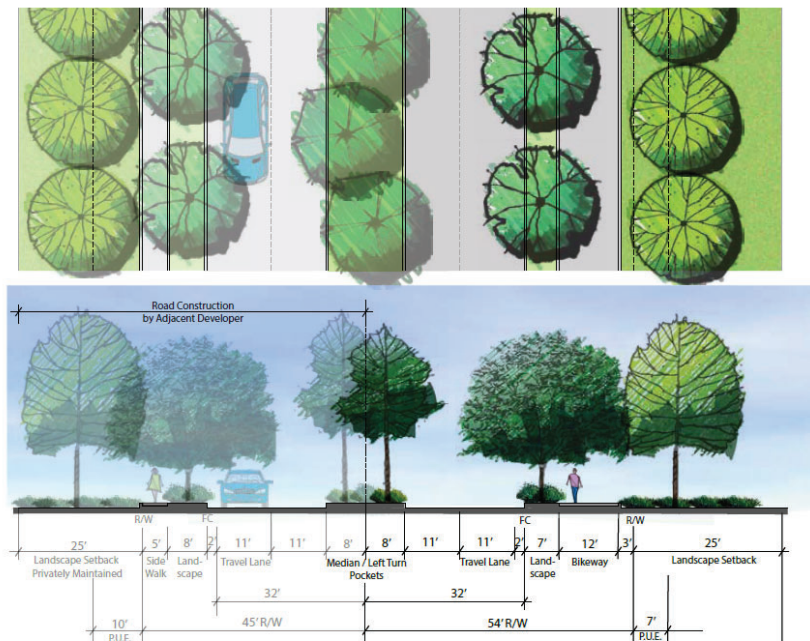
, Conceptual 4-Lane Parkway, Section B-B
